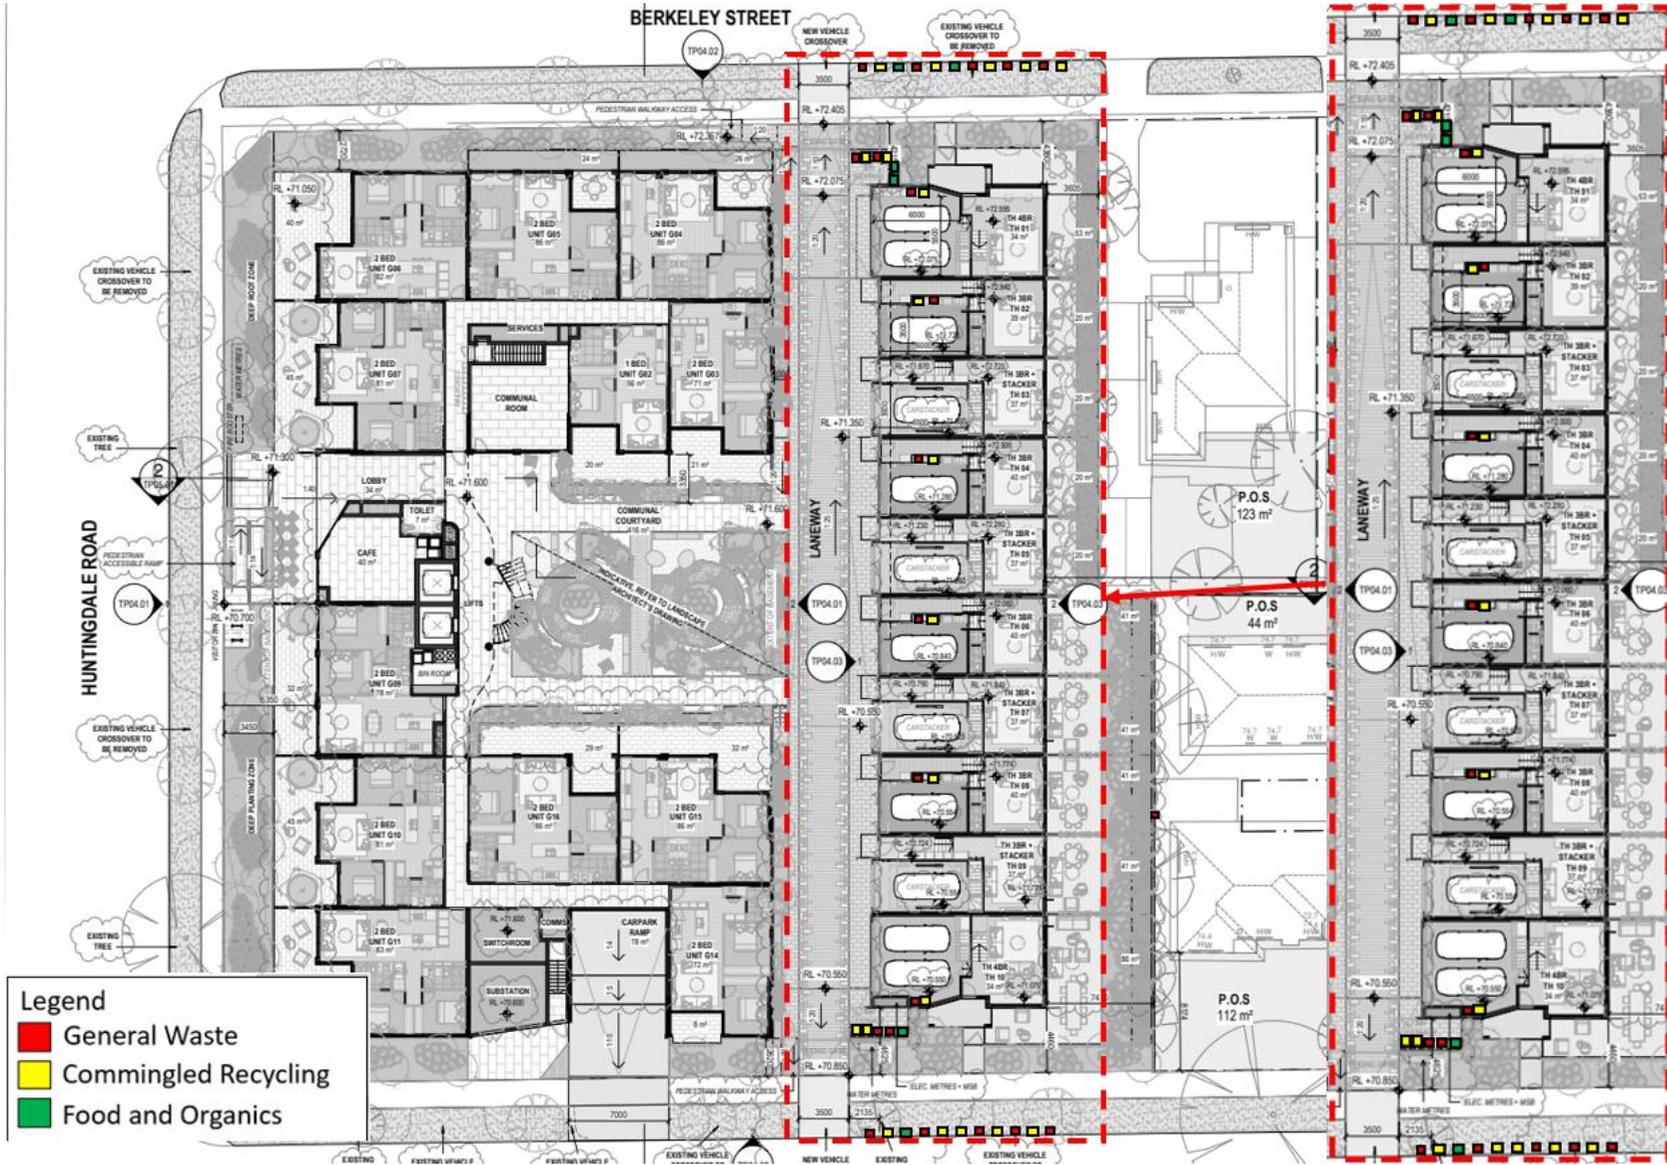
DEVELOPMENT PLAN – TOWNHOUSES (CURRENT)
